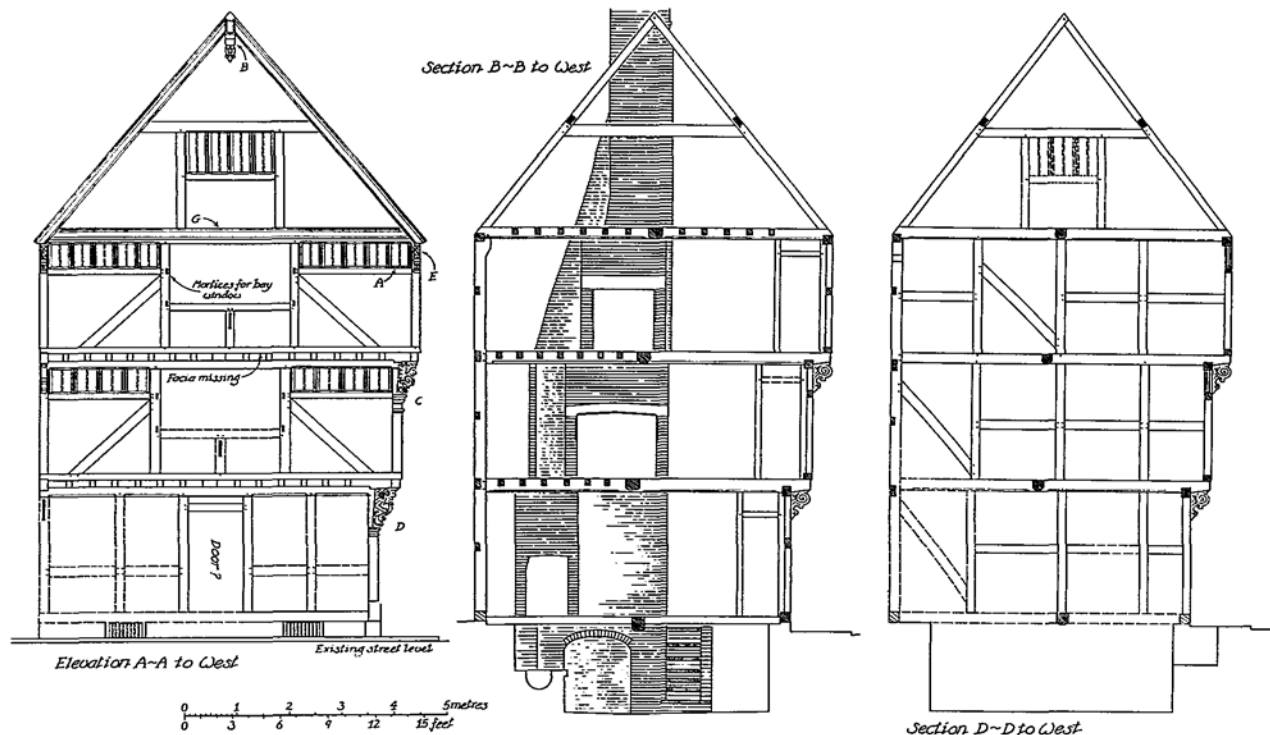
No. 28 Palace Street, Canterbury: Front elevation, cross-section and rear elevation.
